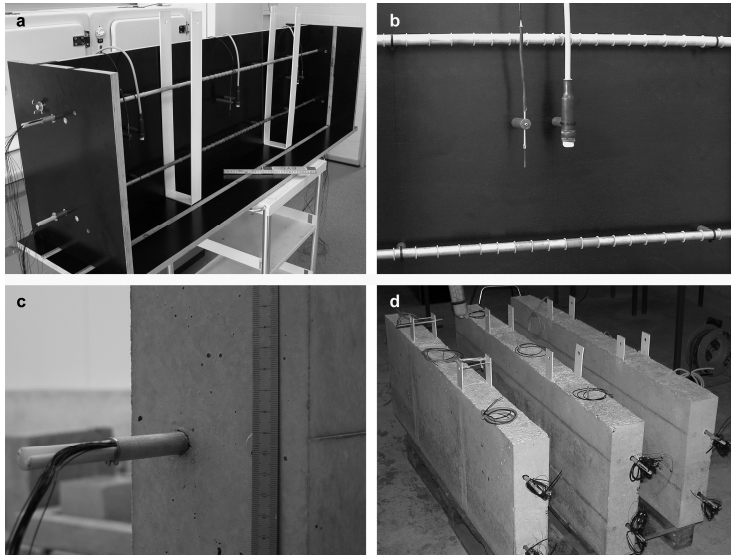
Manufacture of the test specimens. a: Segmented reinforcement bars, reference electrodes and lifting frames are mounted in the mould (side removed for better view). b: All reinforcement segments are isolated with silicone rings. c: The fibreglass bar with the connecting wires and a part of the end of the 160 mm end-segment protruding from the specimen. d: The three test specimens after production. From Nygaard (2008).
